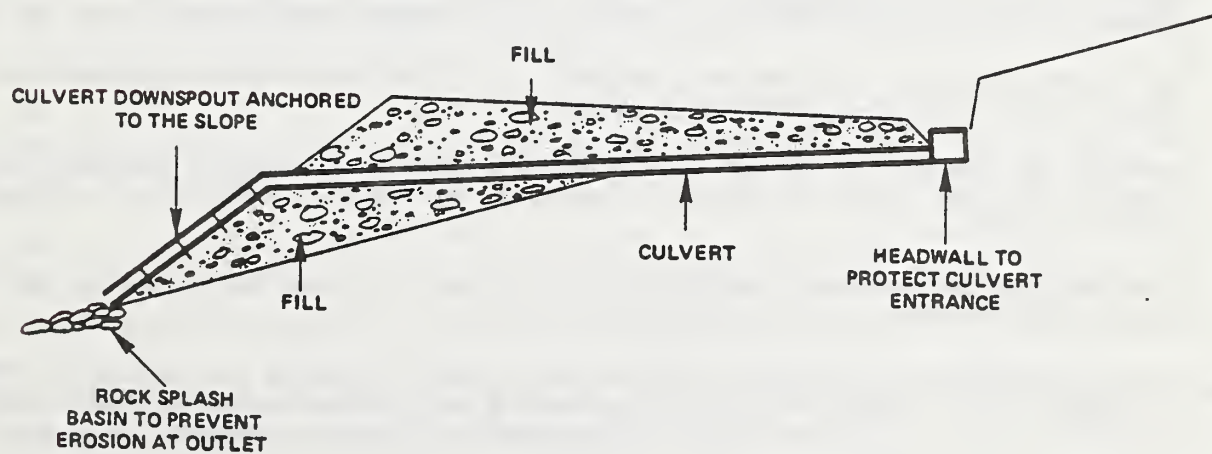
Culvert installation illustrating the use of a headwall, downspout, and a splash basin at the downstream end.
